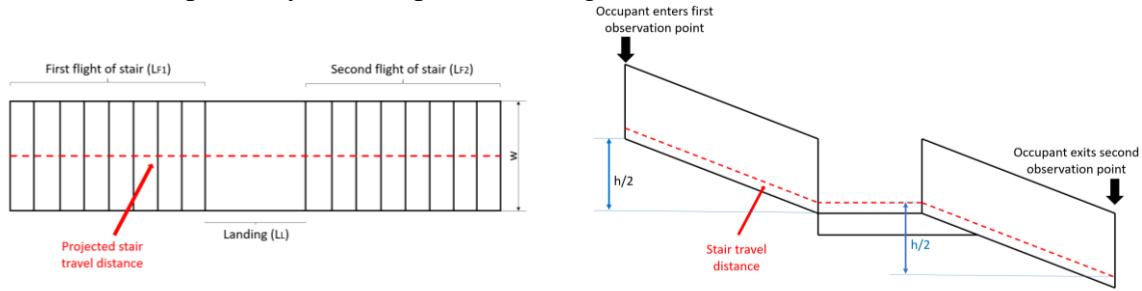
overview of straight flights of staircase 204 between two floors, its landing, staircase travel distance and width
